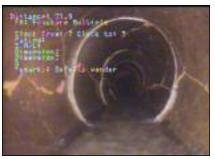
This fractured clay pipe should be burst due to the extent of deformation
